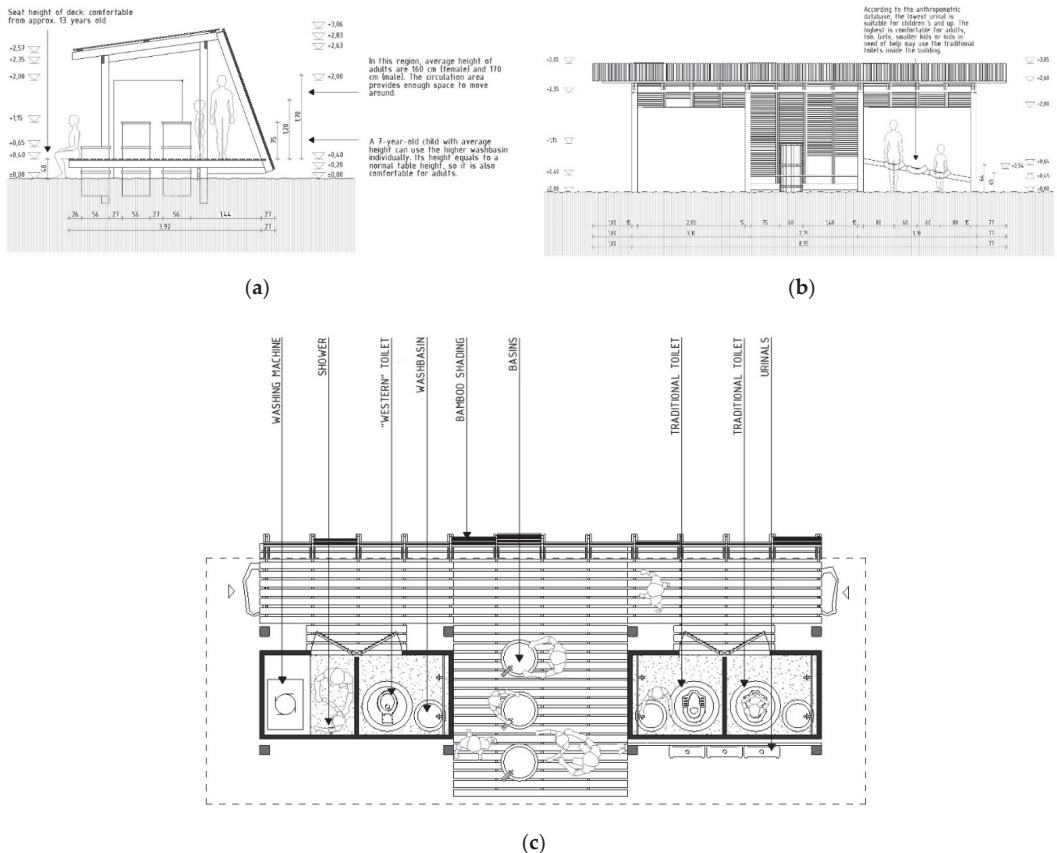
(a) Cross-section of Bathhouse; (b) elevation of Bathhouse; (c) floor plan of Bathhouse. Figures: Own drawings of the author (Mizsei, A.) based on TYIN Tegnestue Architects (Andreas G. Gjertsen, Yashar Hanstad), Available online: <http://www.tyinarchitects.com/> (accessed on 13 July 2021).
